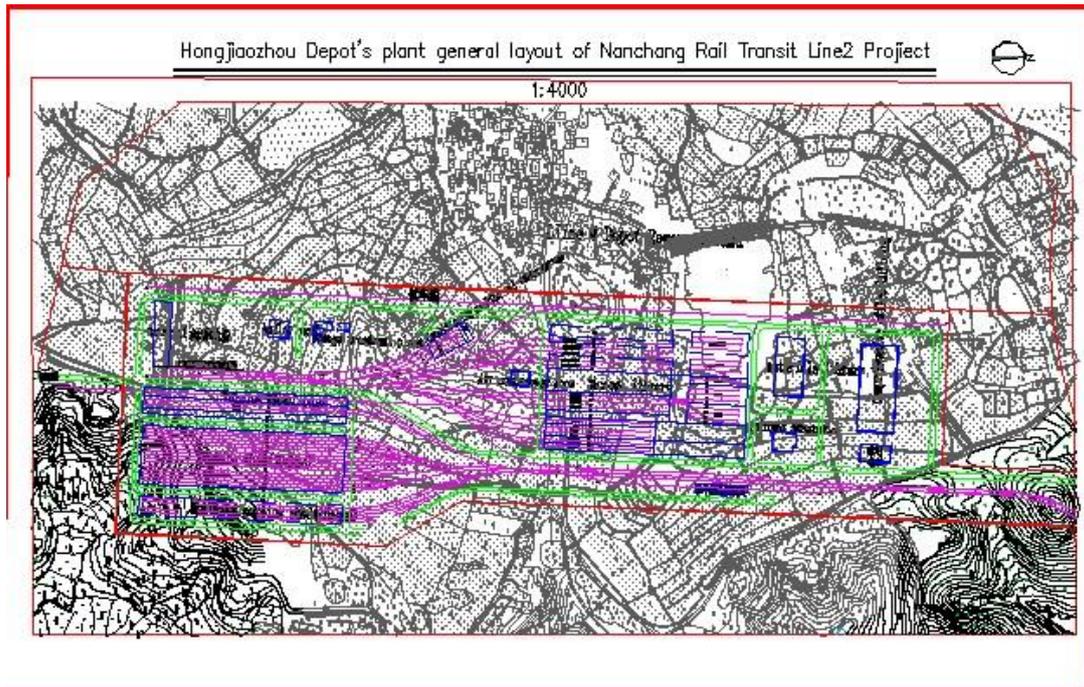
General Arrangement Plan of Hongjiaozhou Car Depot
